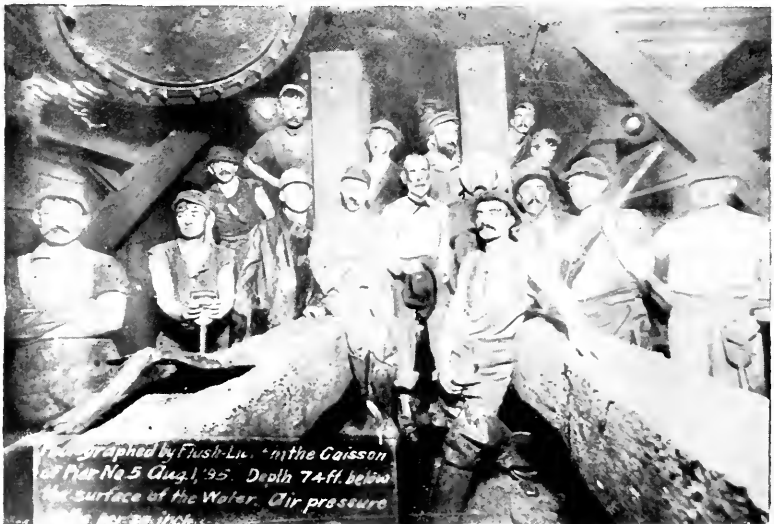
INTERIOR OF A CAISSON, 74 FEET BELOW WATER-LEVEL.
